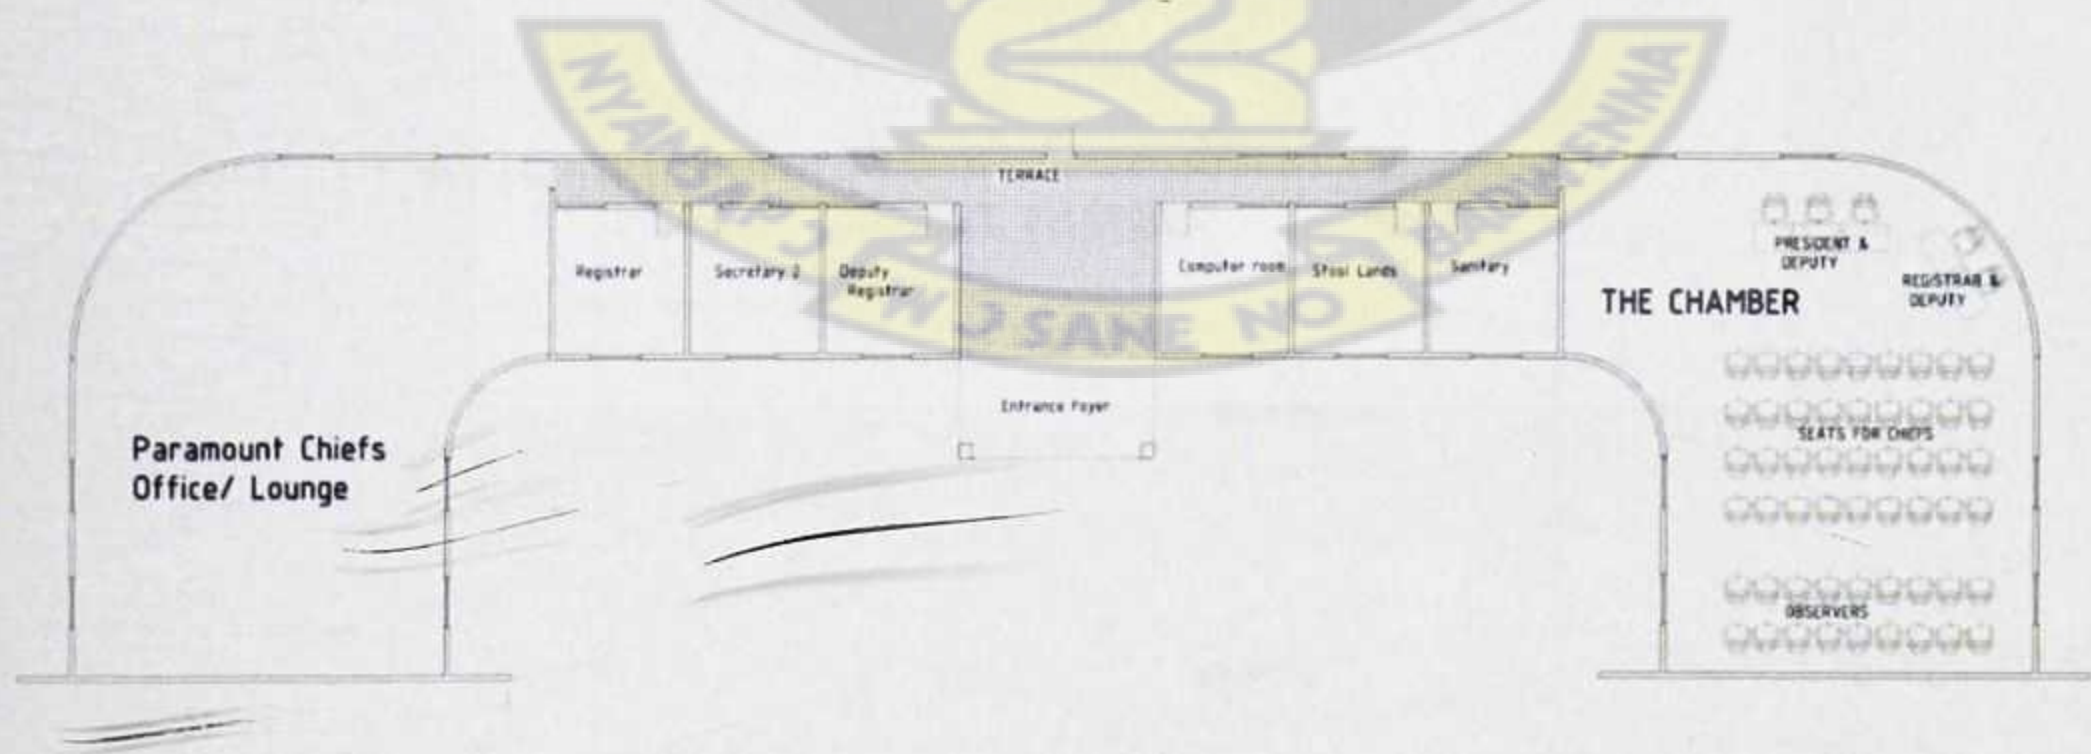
, Floor plan of the Wenchi Traditional Council.
